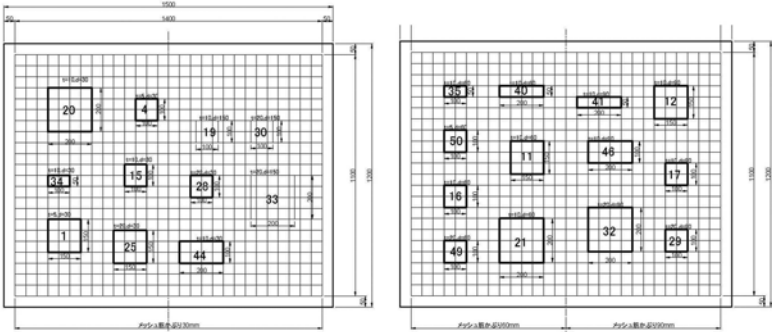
Dimensions and locations of spalling damage in a concrete specimen.
